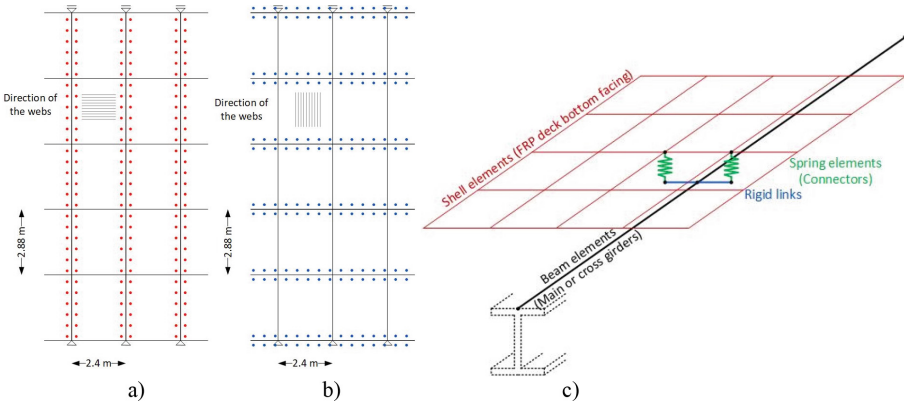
The bolted connector layout of the generic bridge, a) Transverse webs (Web_{90}), b) Longitudinal webs (Web_0), c) Detail of pair of rigid and spring elements that connect steel beam to FRP deck in model
